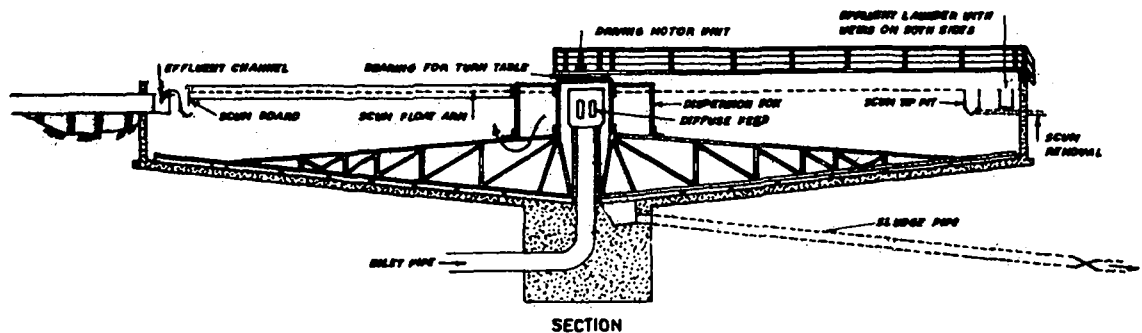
(b) TYPICAL DETAILS OF SEDIMENTATION TANK
